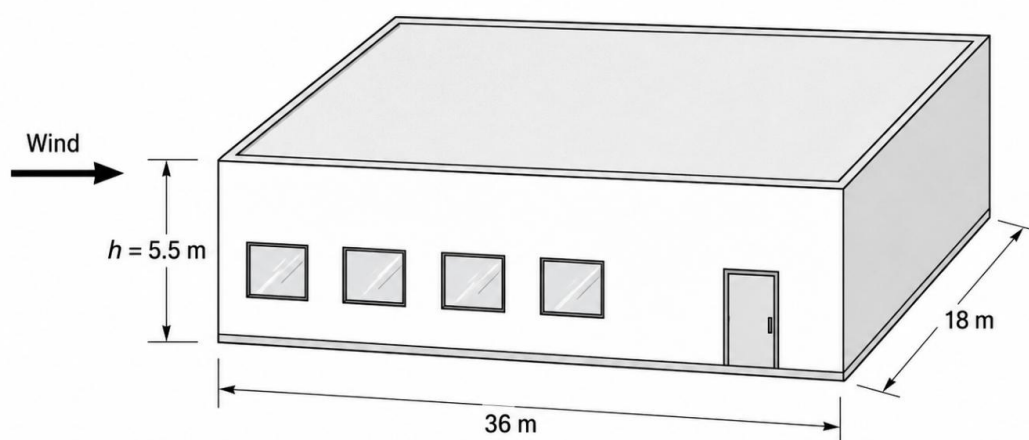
Flat-roof retail building geometry used in Worked Example 1. Building dimensions are 36 m by 18 m, with mean roof height $h = 5.5$ m.
